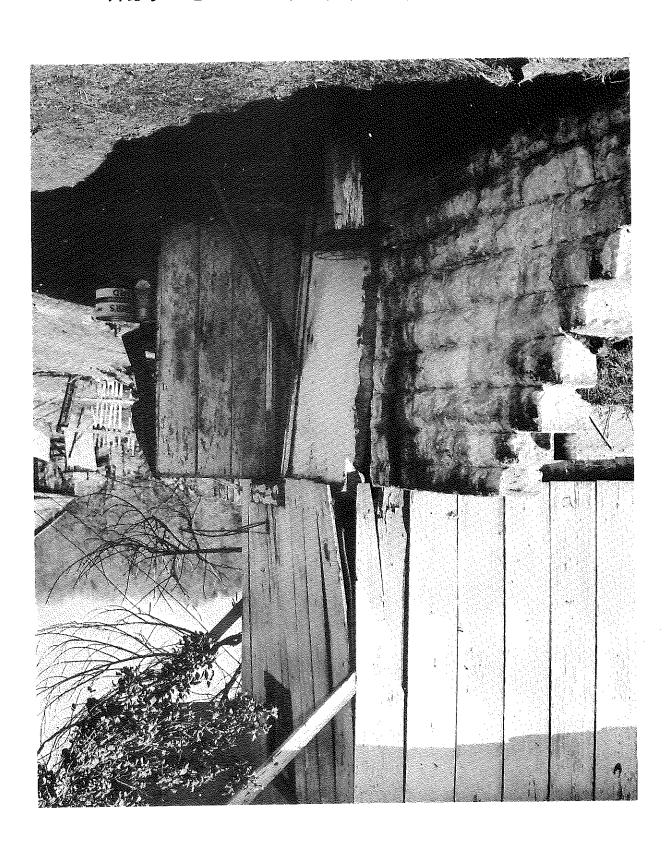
Cracked and Tilted Walls at Toe of Slide.
